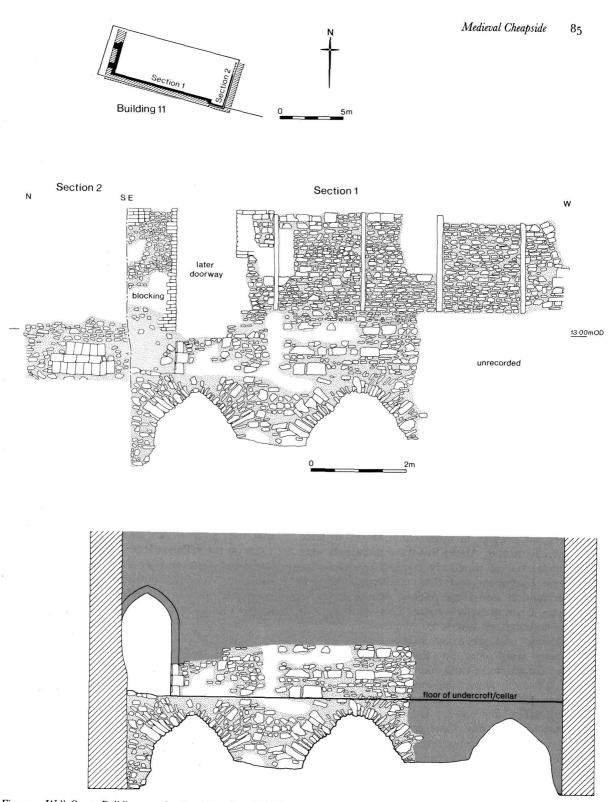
Well Court: Building 11, elevation of south wall with arched foundations (1:80). In this and Fig 21, the tone indicates medieval masonry removed by later modifications.
